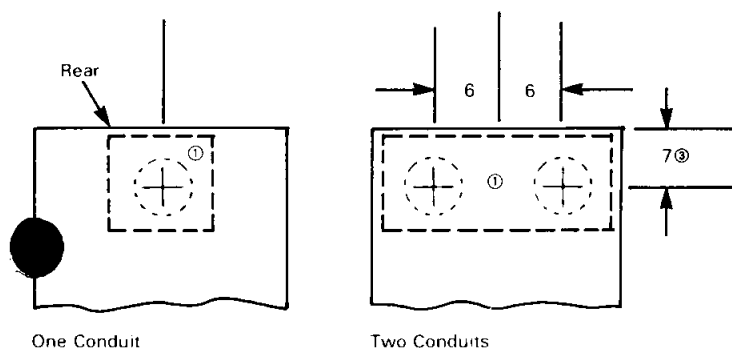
Fig. B — For Entrances Into Cable Enclosure (Or Cable Enclosure Area)
